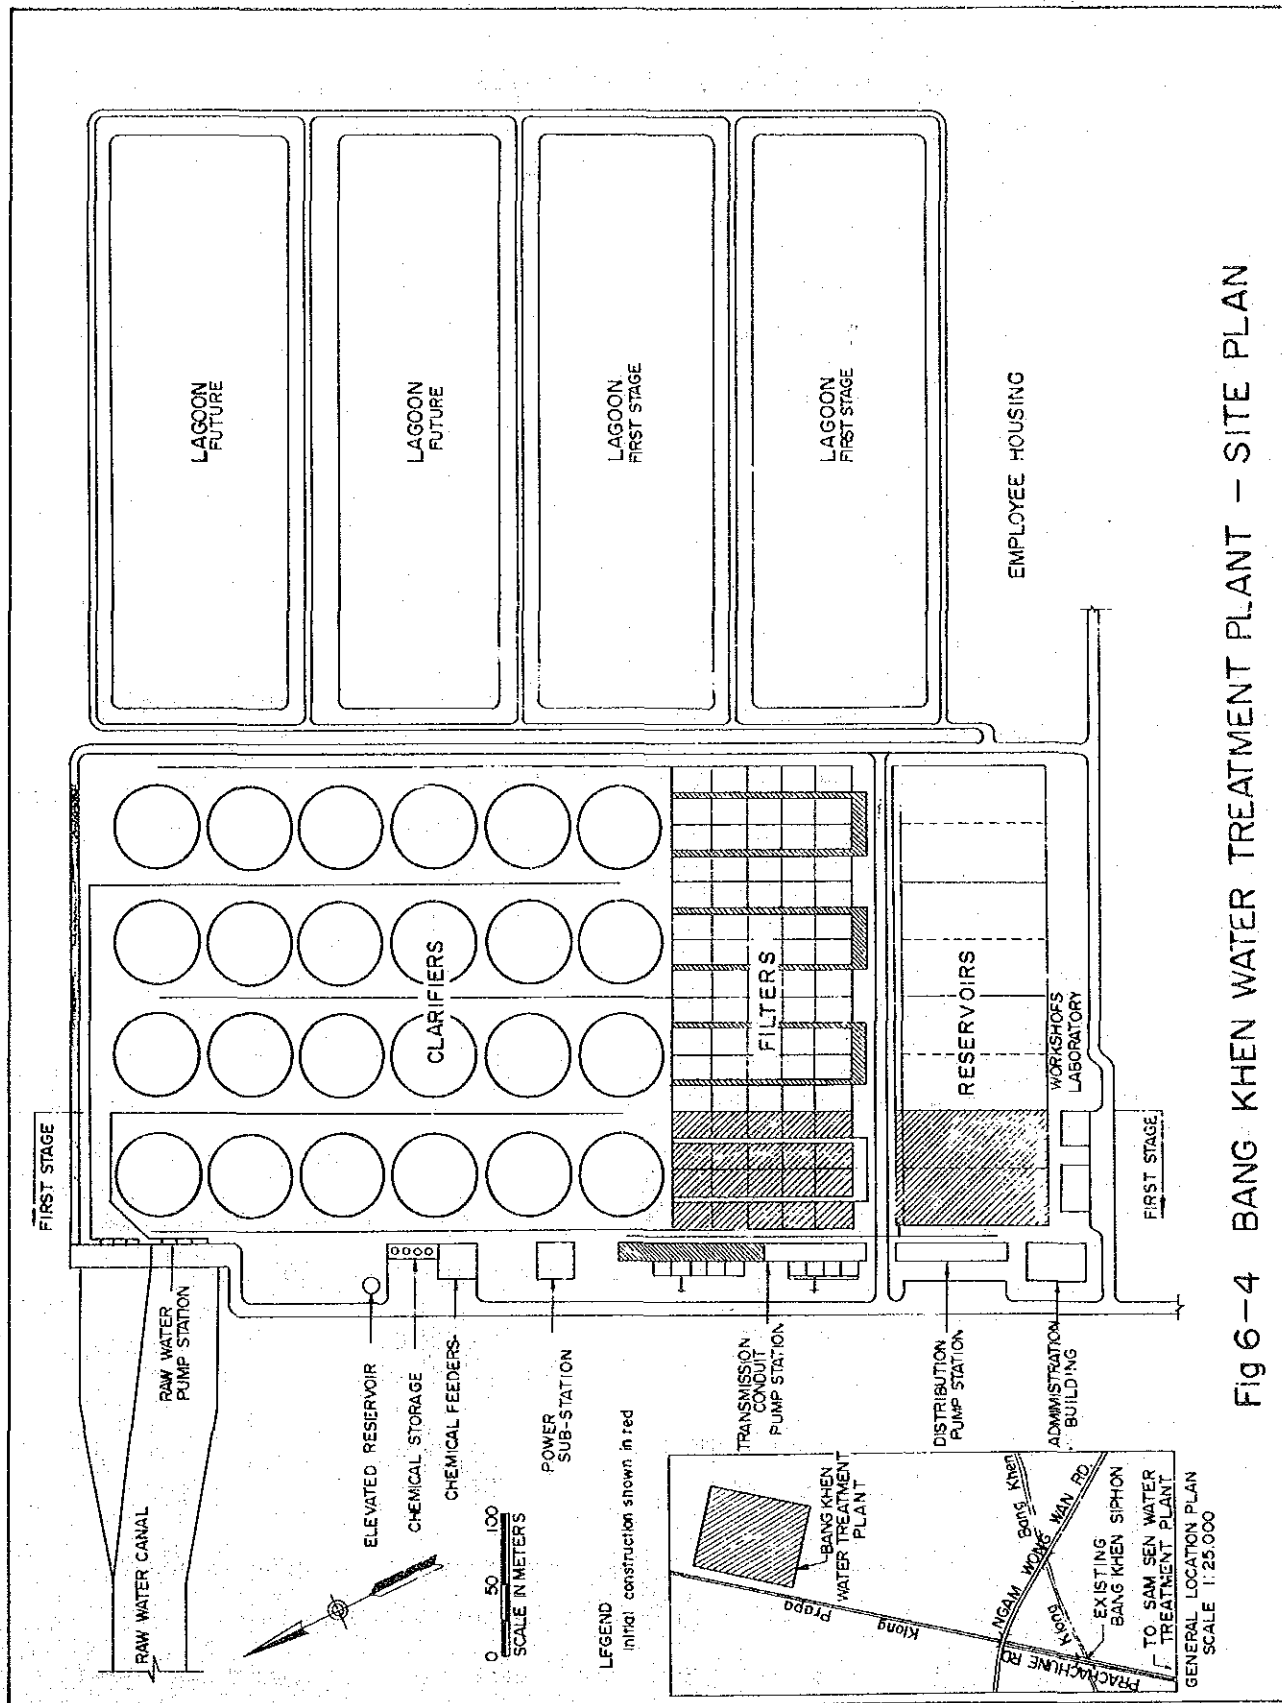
BANG KHEN WATER TREATMENT PLANT - SITE PLAN
